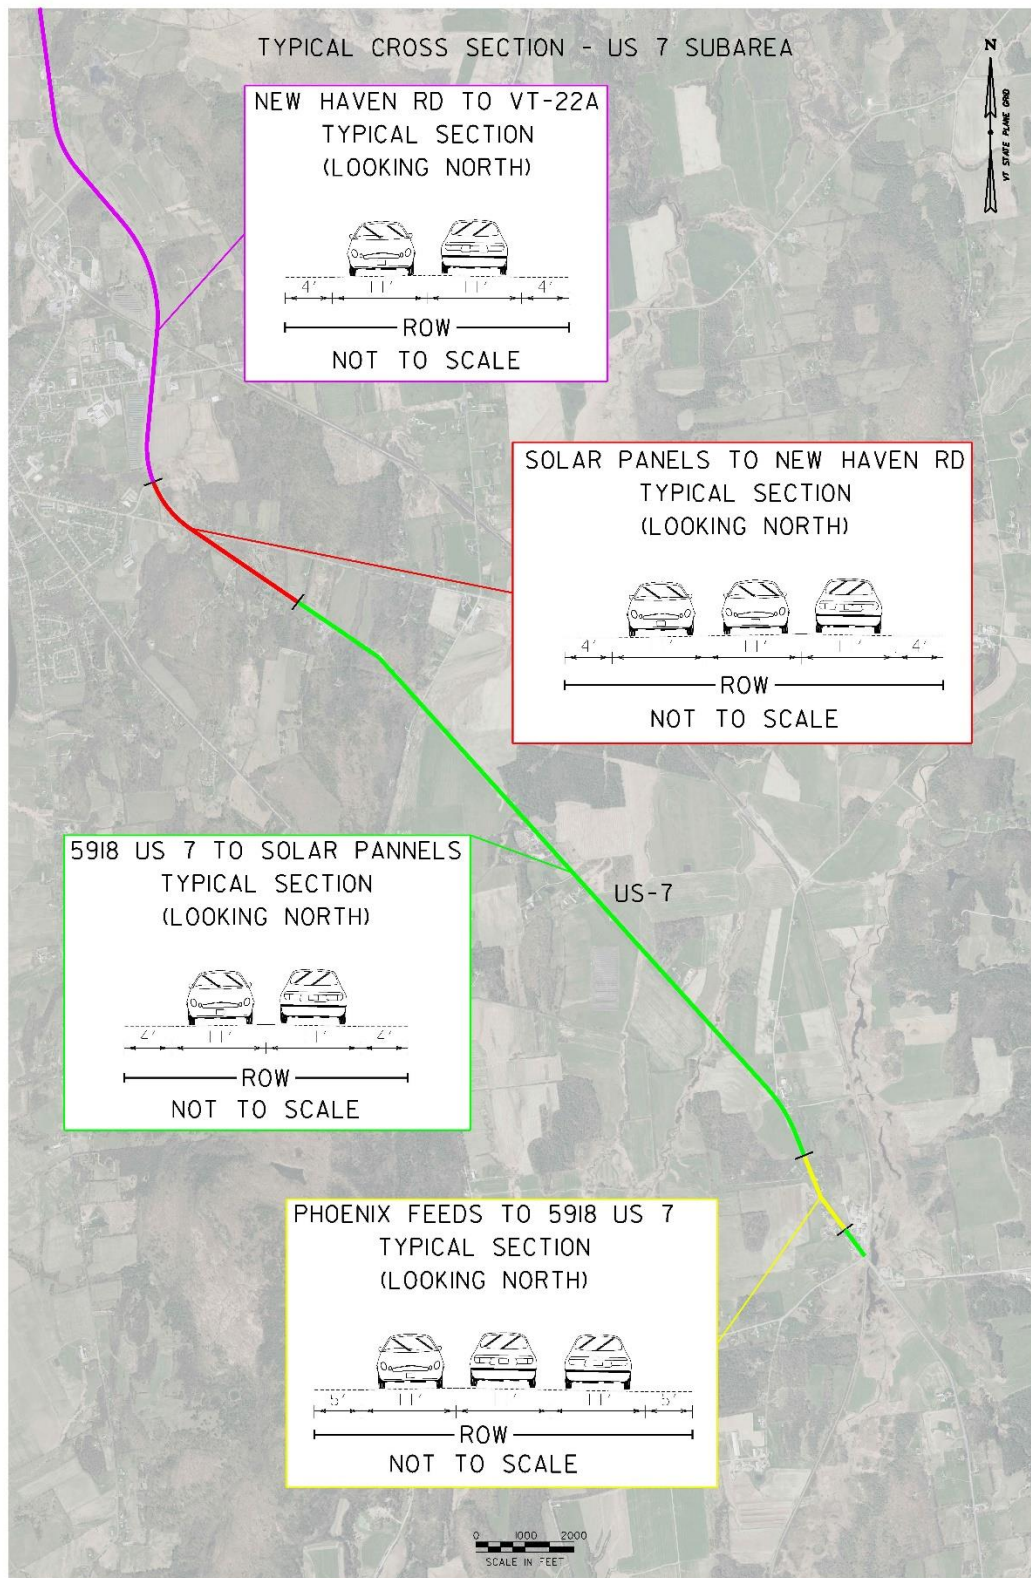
US 7 Subarea and Roadway Cross Sections
